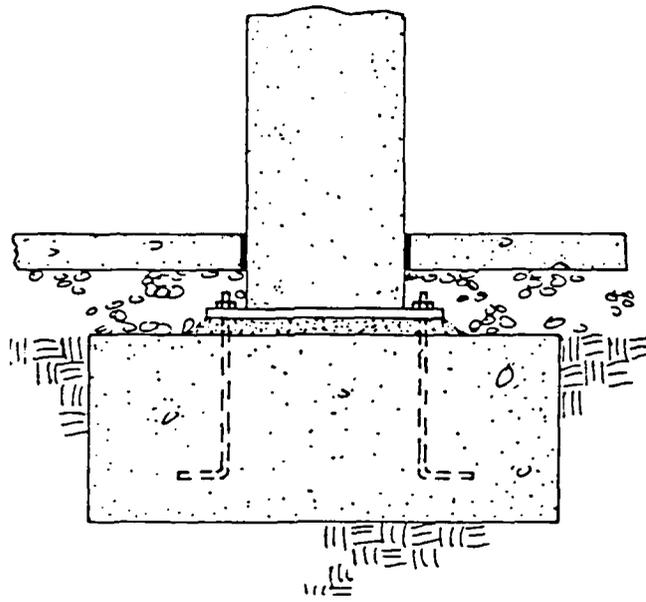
Precast Column Base Connections. (Ref. 21)
